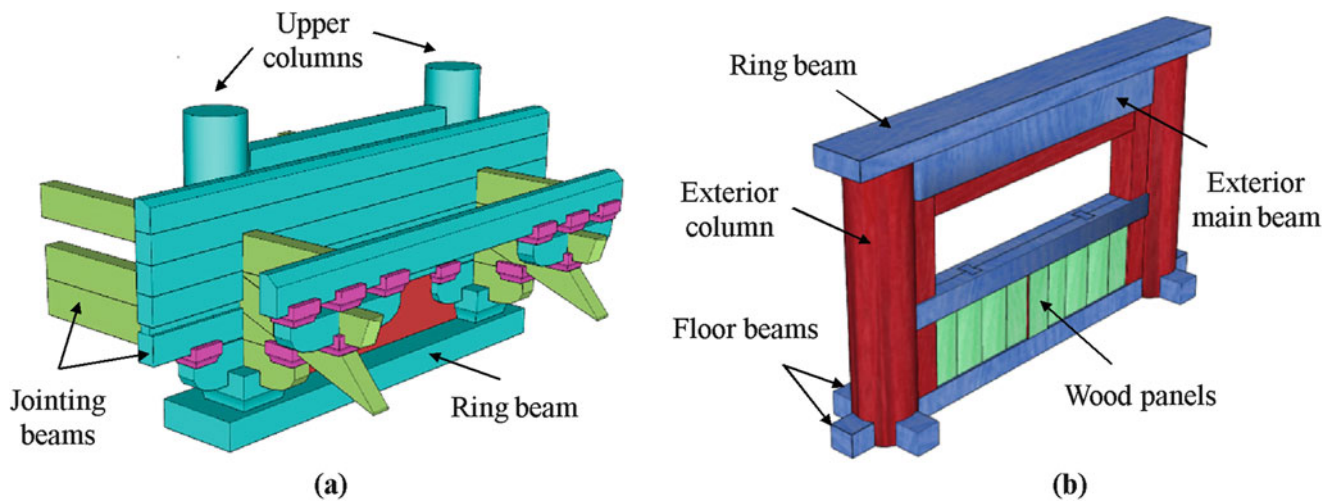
Details of structural components (a) Dou-gong connections (b) timber framed shear walls
